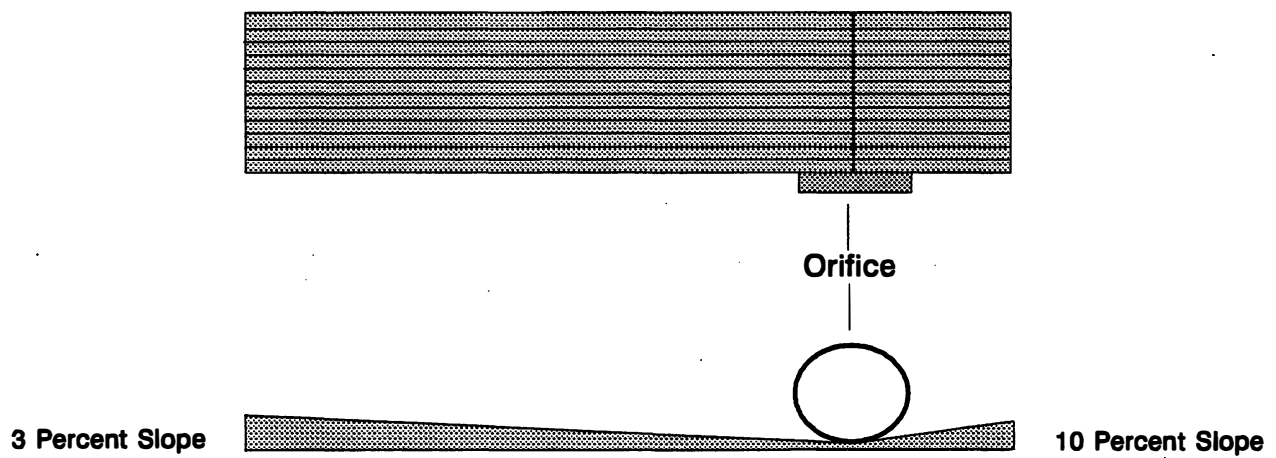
Plan and side views of lift-tank floor (gate) showing slope to the orifice.
